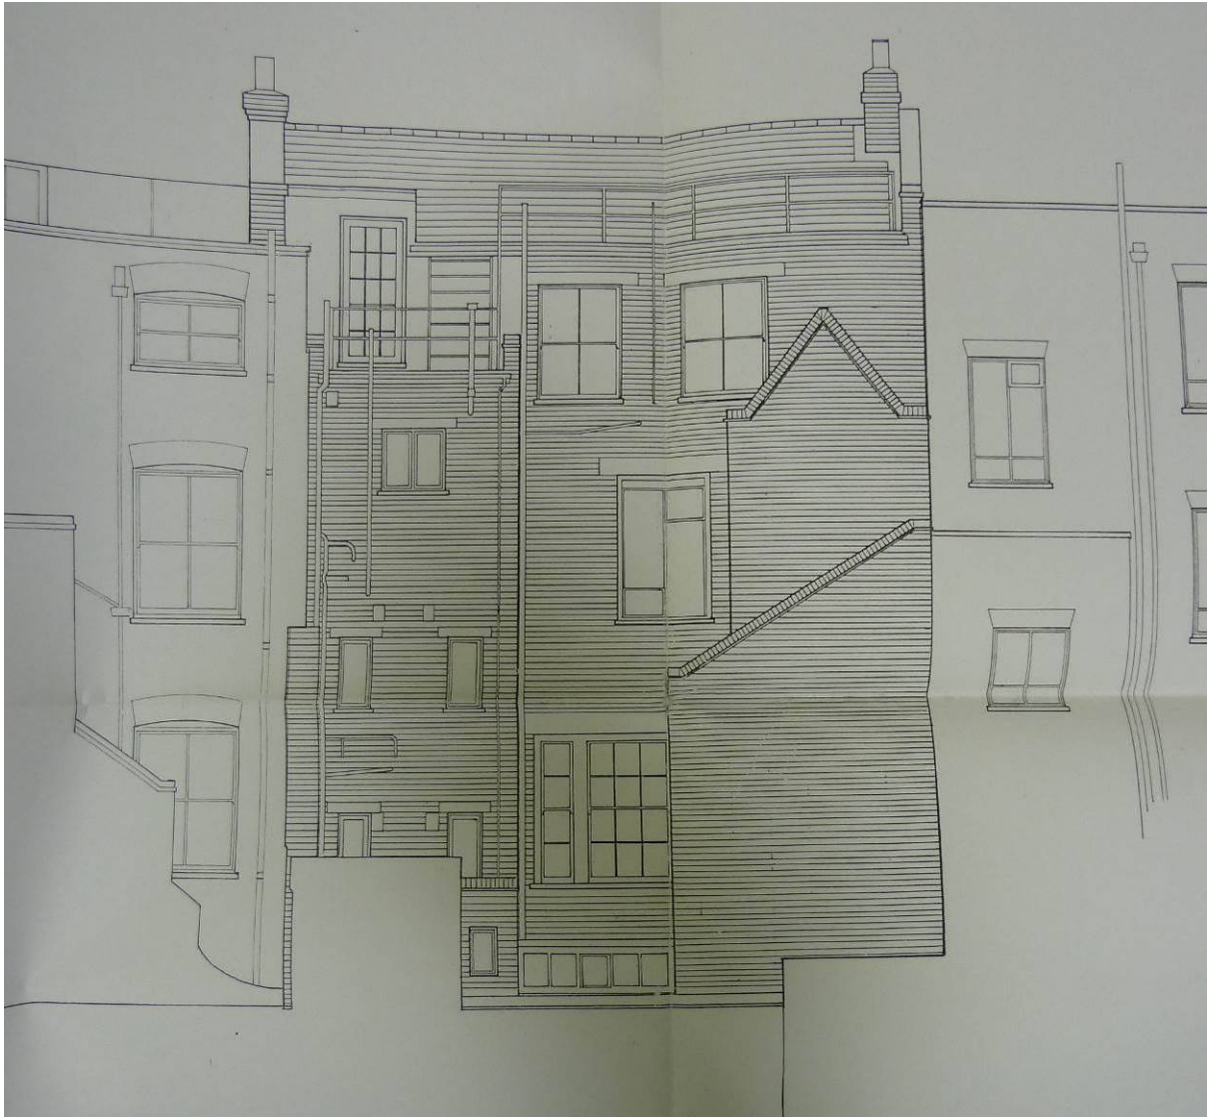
The rear elevation as existing in 1990, Gerald Steer
